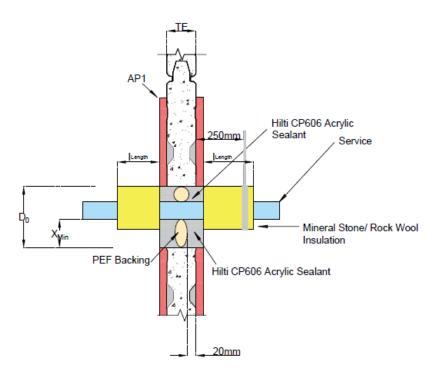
Metal pipes in minimum 51 mm Korok panel system with AP1 and AP3 additional protection
